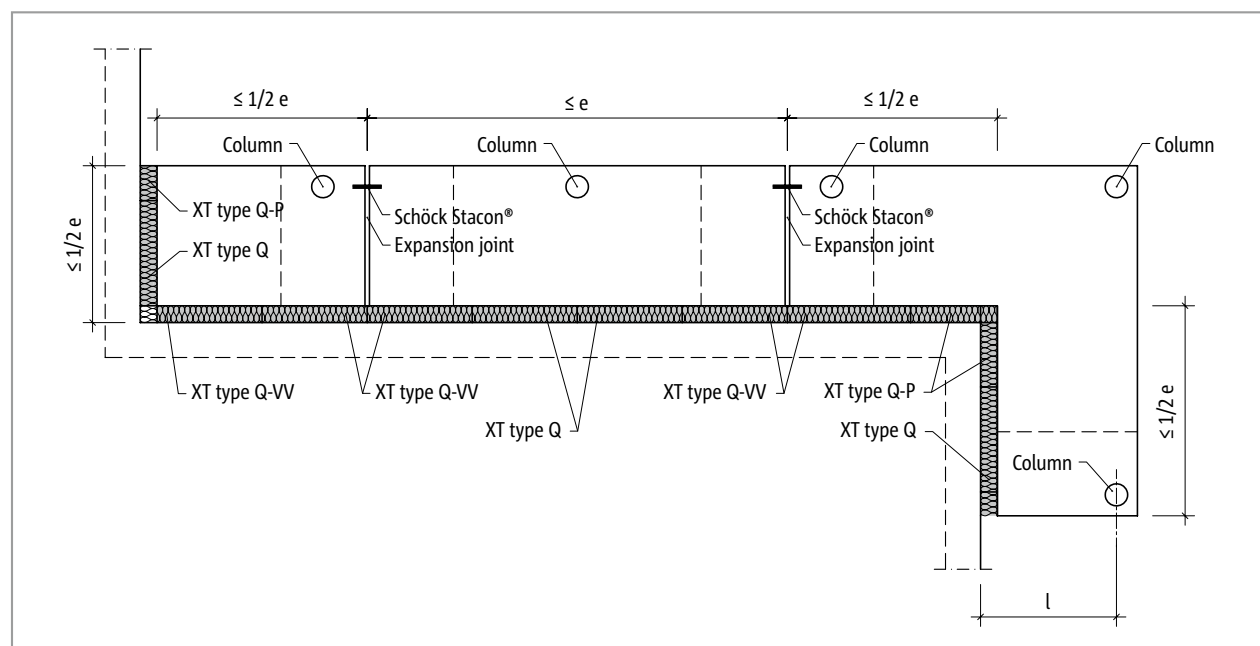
Schöck Isokorb® XT type Q-P, Q-P-VV: Expansion joint arrangement
